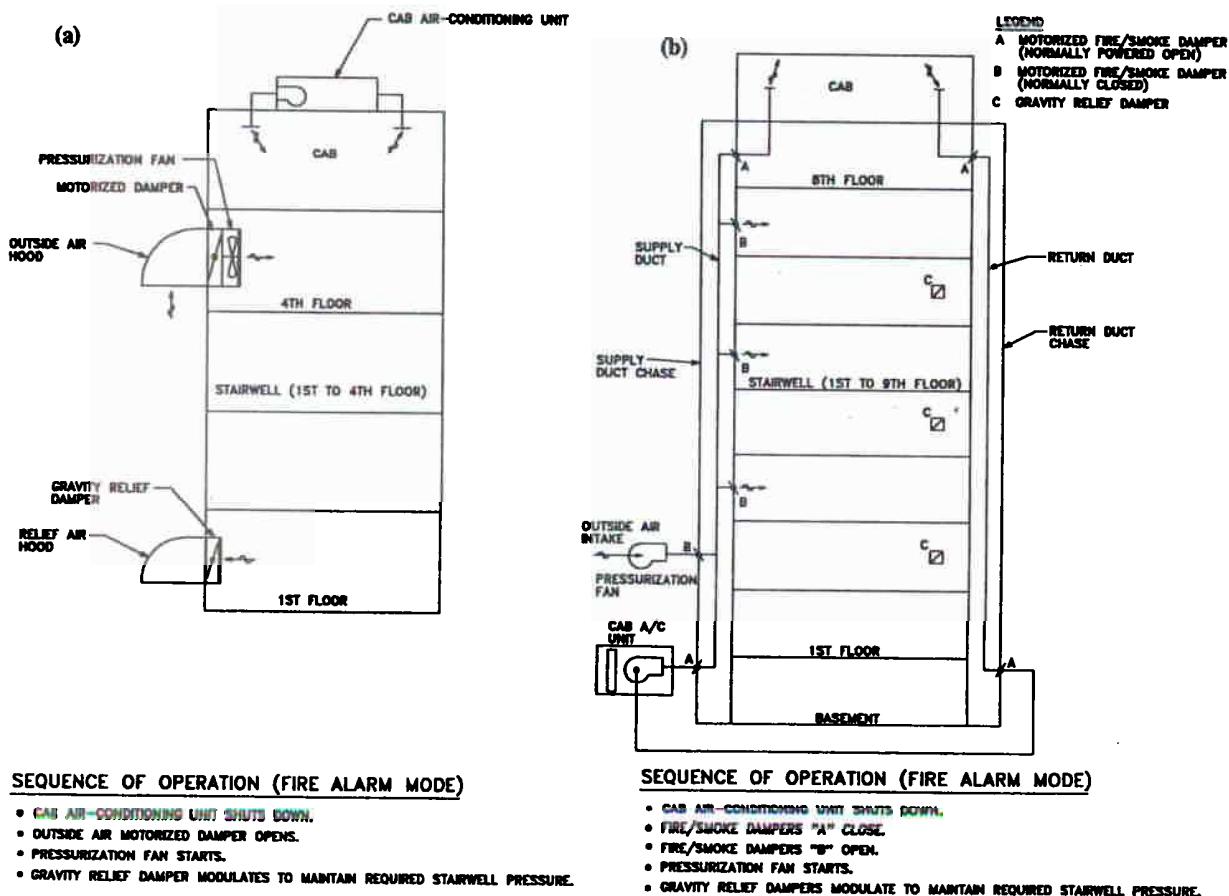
Stair Pressurization System (a) Towers up to 26 m (85 ft); (b) Towers Higher than 26 m (85 ft)
